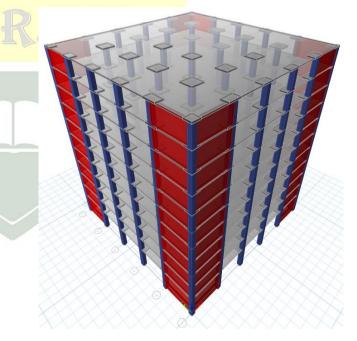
3D model of flat slab without edge beam & with shear wall.
